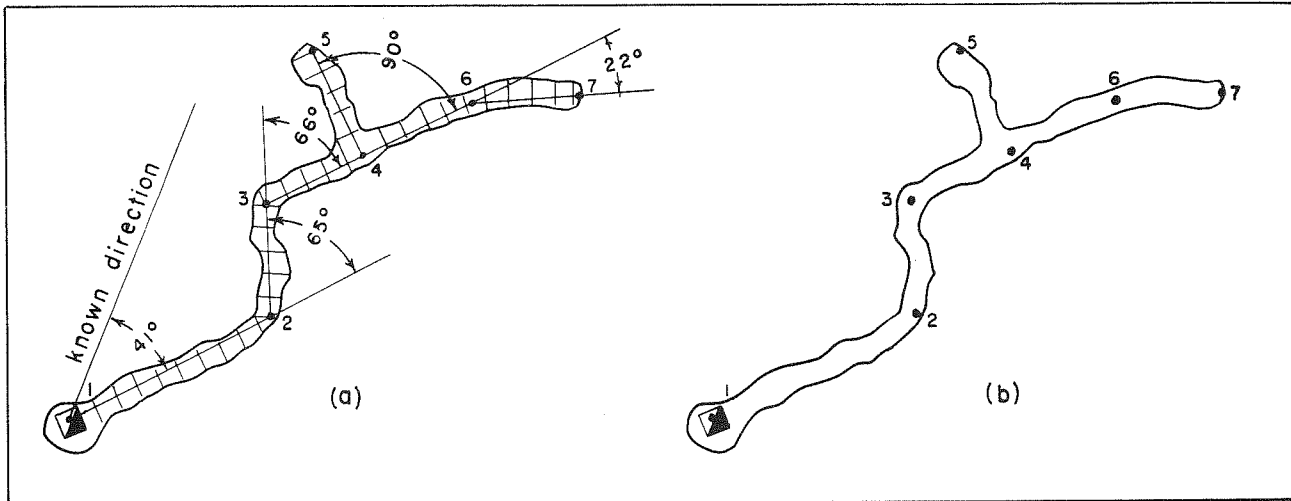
Plan of workings on a mine level (a) showing construction lines, (b) construction lines removed.
